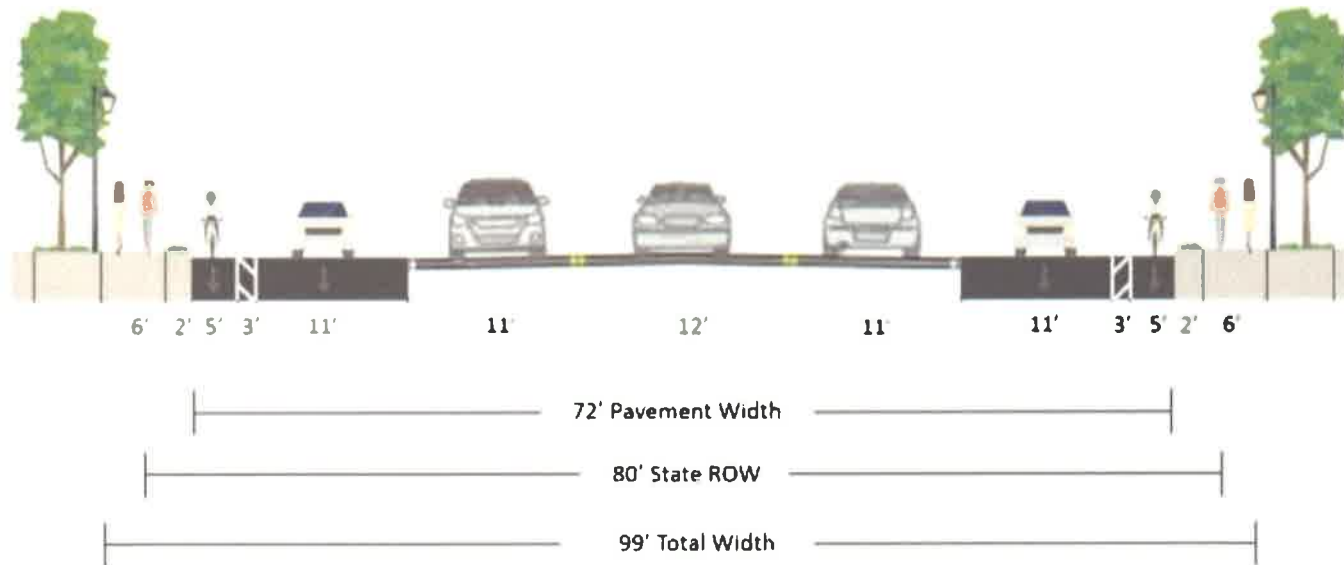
Typical Cross-Section (Brockman Lane to Wye Road at US 6/North Main Street)
